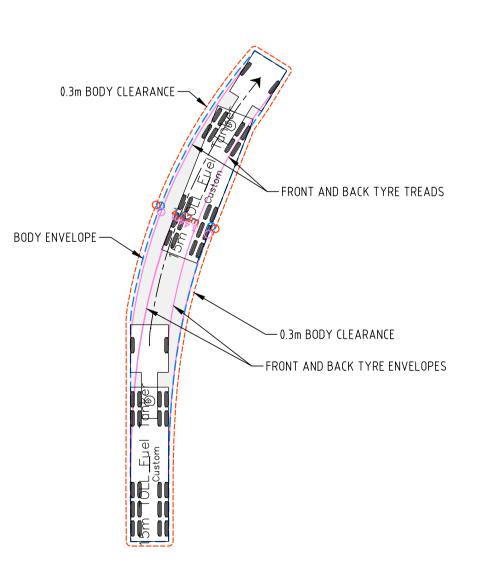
/801 Rev D – 15m Toll Tanker Vehicle Drawing 19-3-34/802 Rev B – Boat and Caravan Options Drawing 19-3-34/803 Rev A – Single Unit Truck
